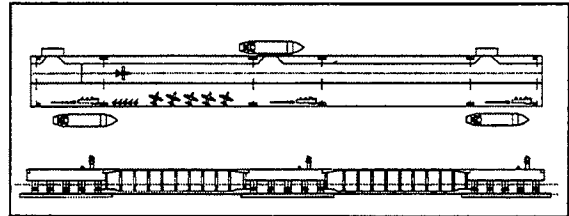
Semi-Submersible Modules with Flexible Bridges MOB – Plan and elevation views, respectively (Courtesy of Kvaerner Maritime)
